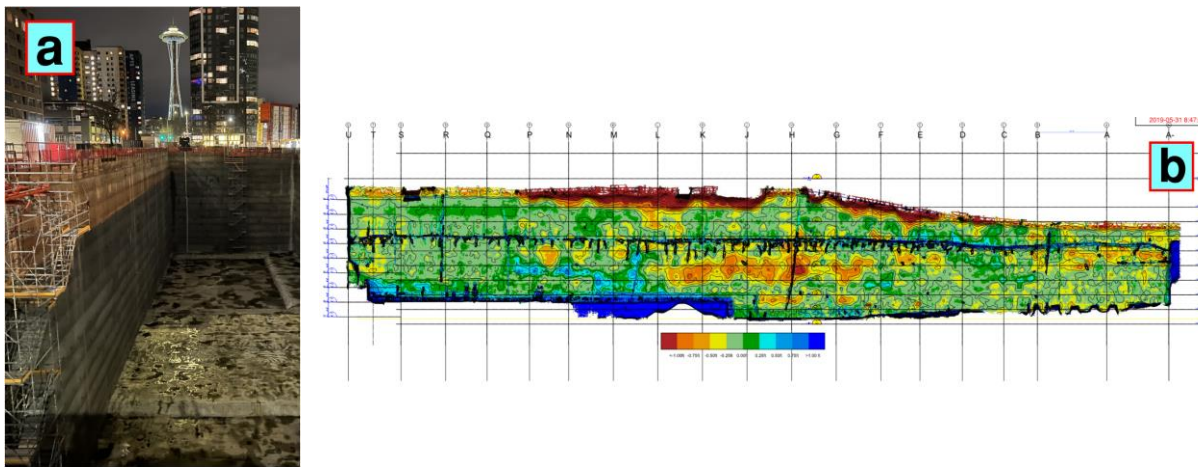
(a) An example of deep excavation for eight levels of underground parking and (b) shotcrete surface data collected with TLS and WLS.
